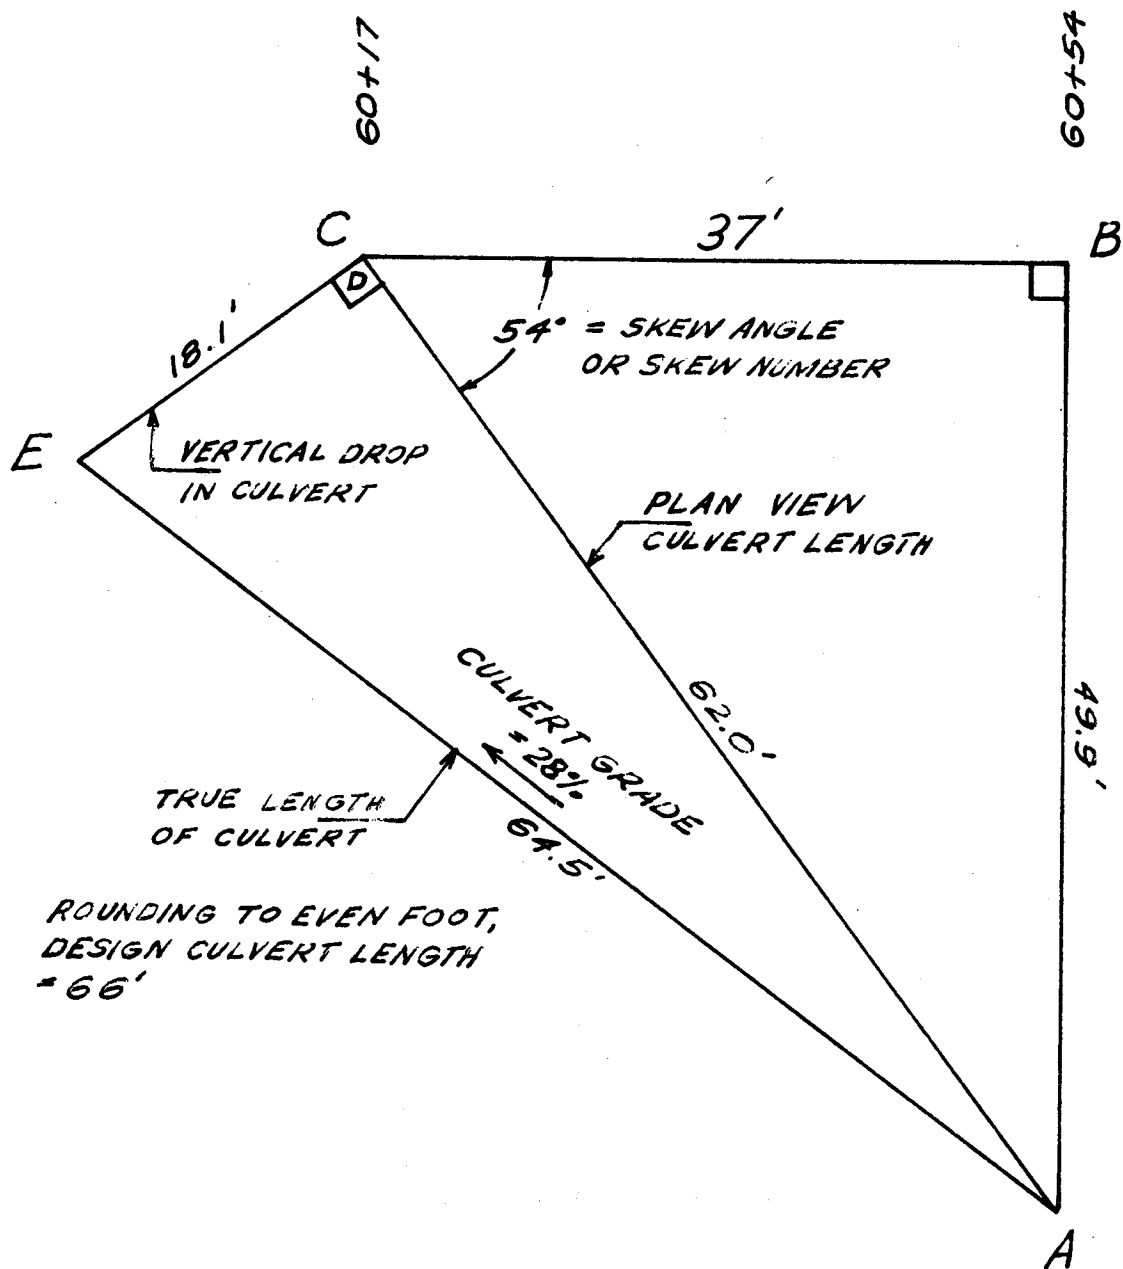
Scaled Layout Used in Determining Length of Culvert
